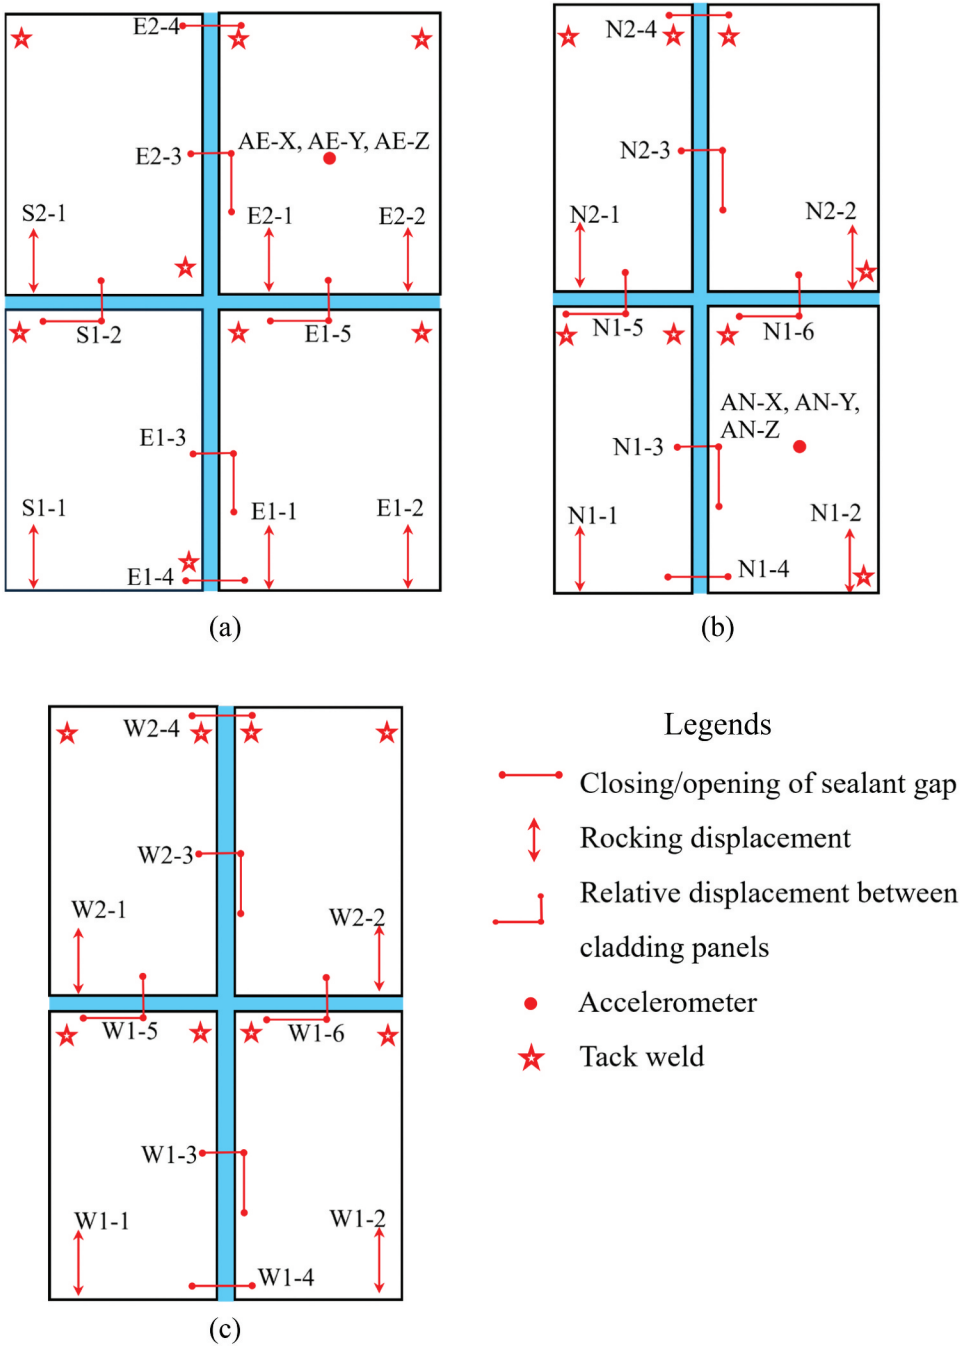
Instrumentation layout for cladding panels: (a) south-east elevation; (b) north elevation; (c) west elevation.
